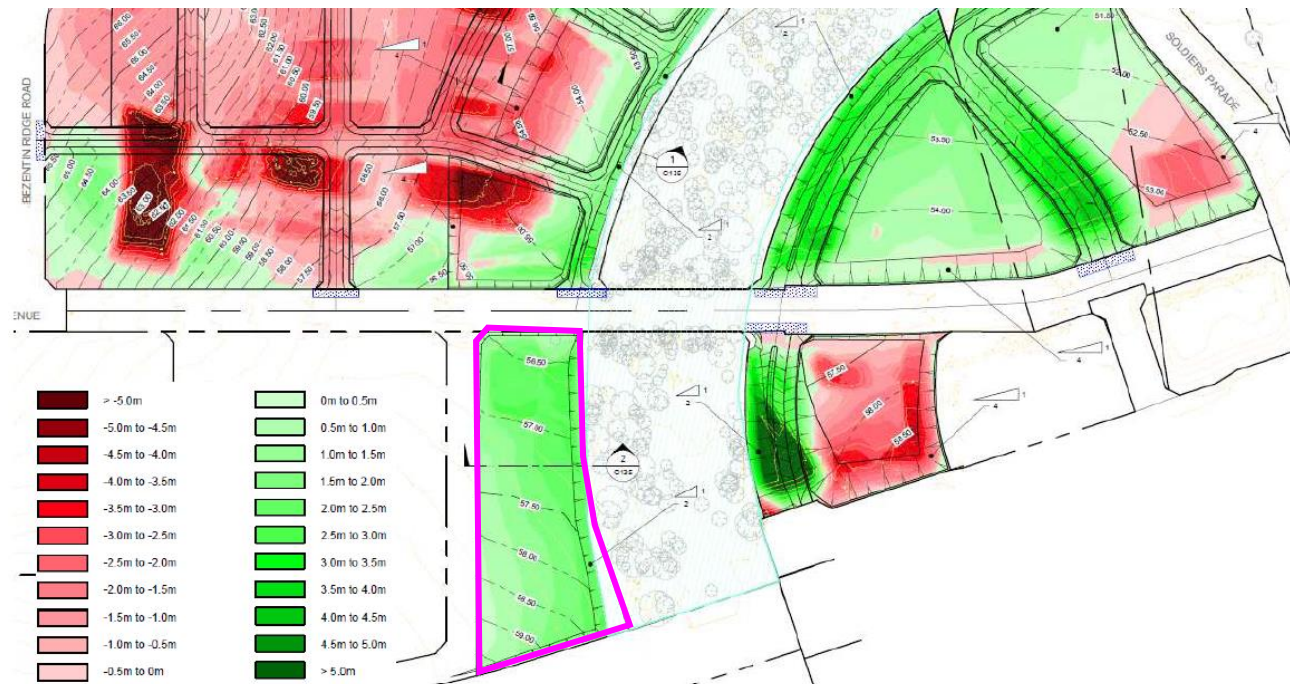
DA-1073/2021: Bulk Excavation Profile Across Site
